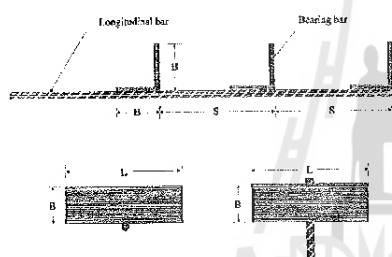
Typical schematic view of the bearing reinforcement (Horpiulsuk and Niramitkornburee, 2010)
